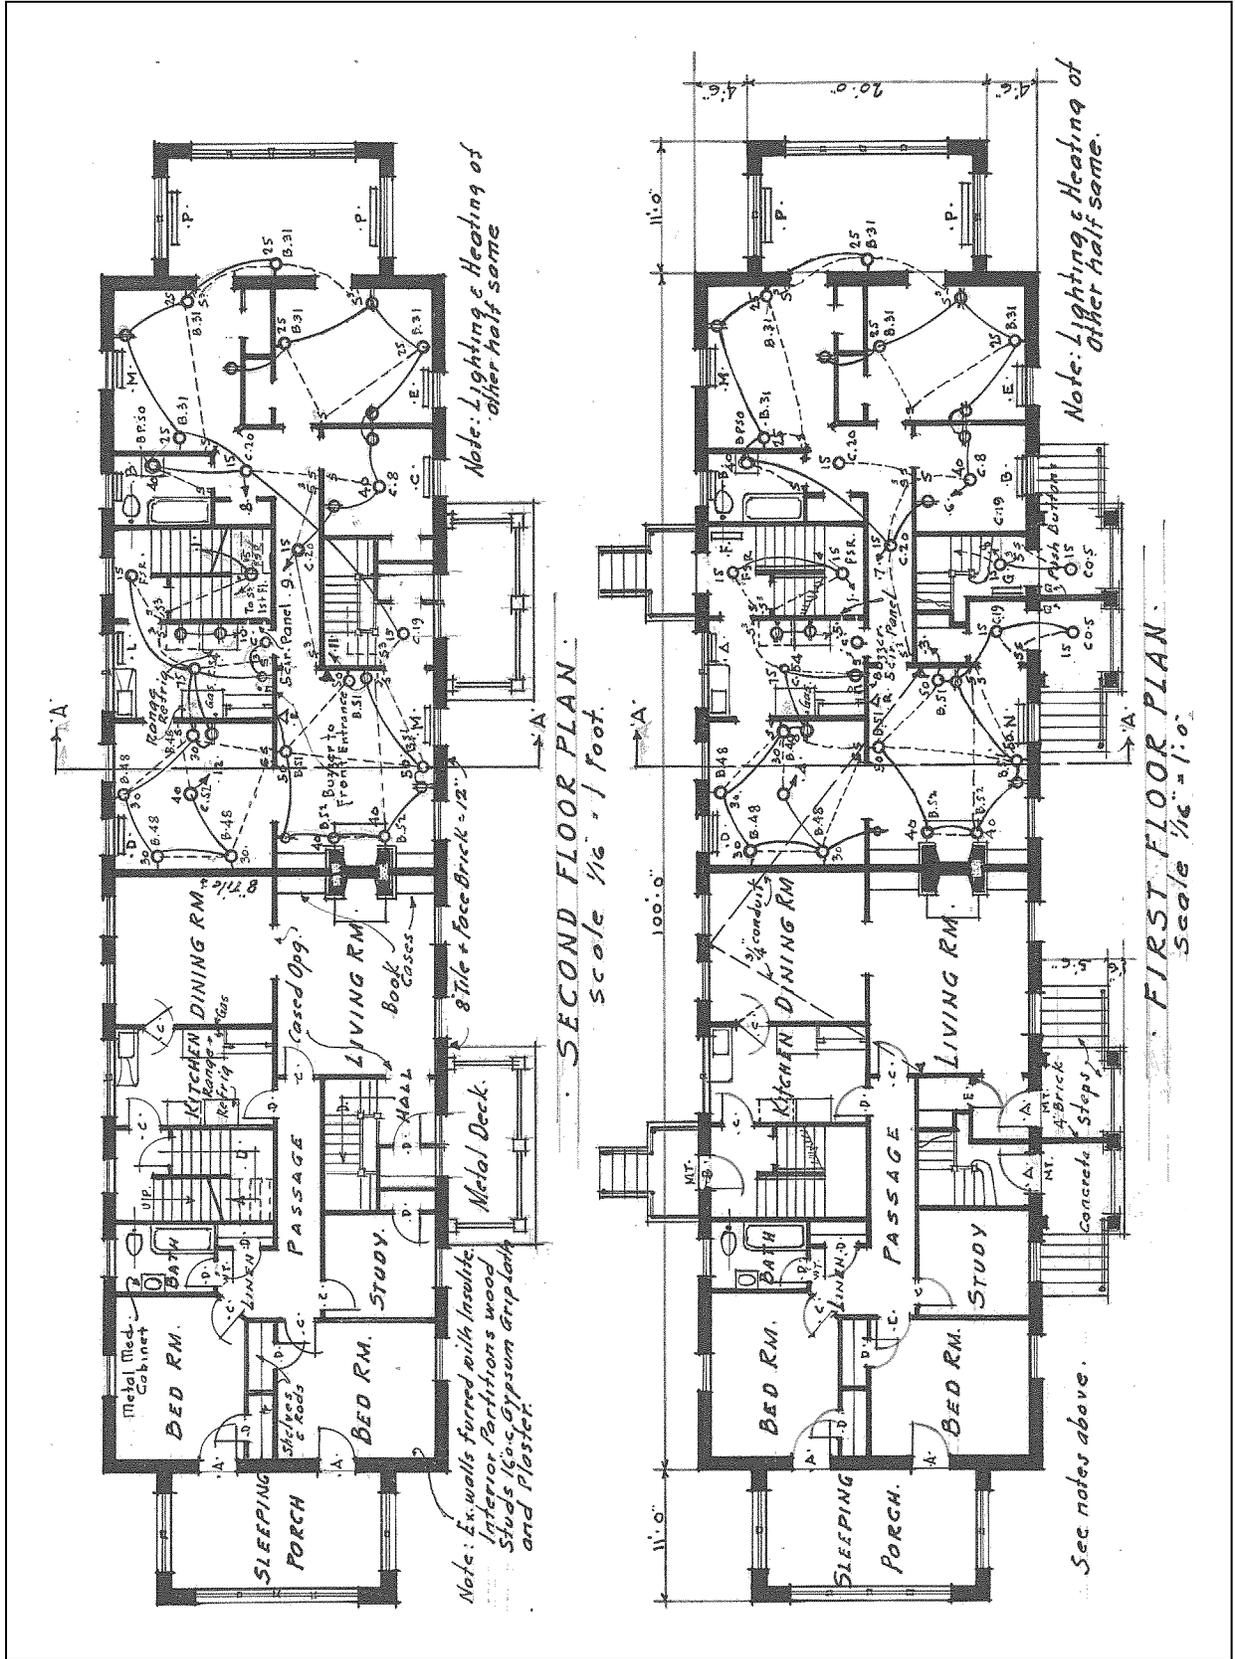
Typical floor plan of four-family student apartment building at Fort Lewis, Washington (Source: U.S. Department of the Army 2021).
